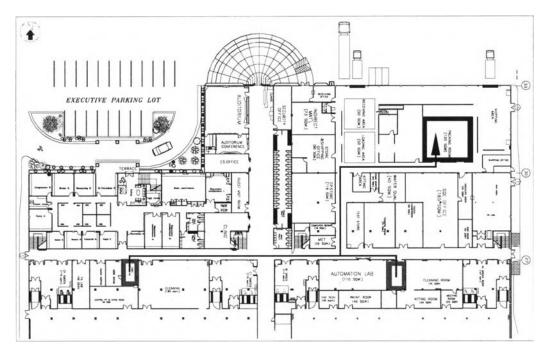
Cleanroom Load out area to Packing Area outside Cleanroom
